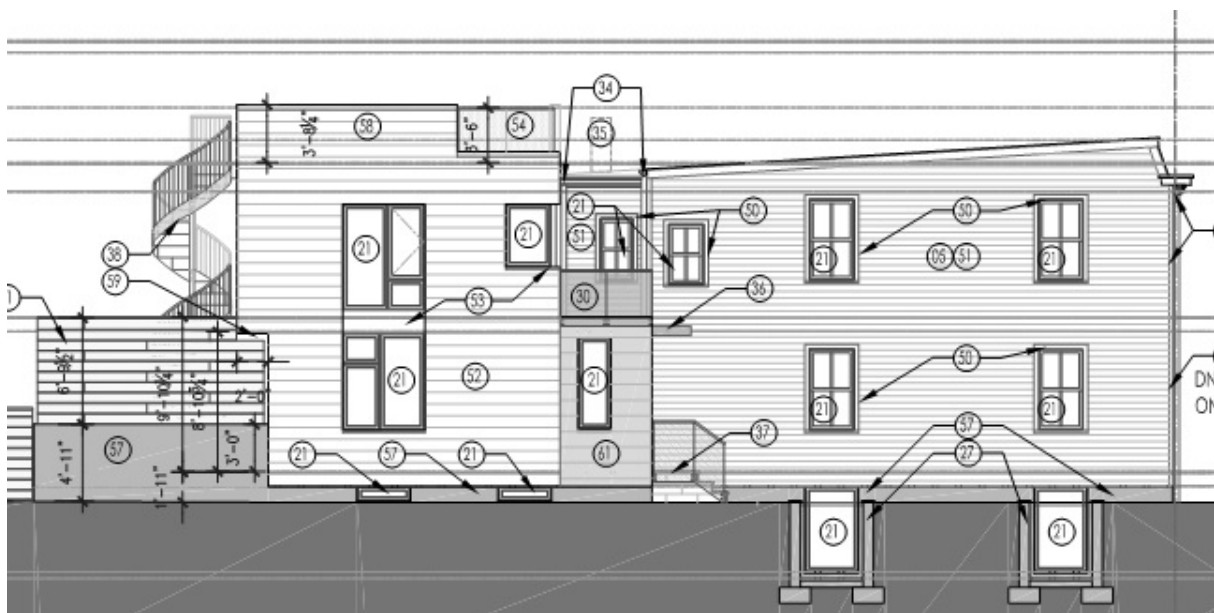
New submission east elevation; note the regular window pattern on the addition and similarity of siding materials
